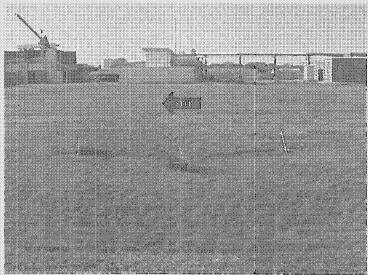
Proposed Site, NASA Consolidated Battery Test Facility, Johnson Space Center, Houston, Texas. Proposed site location of the NASA Consolidated Battery Test Facility viewed from T-4 Avenue along the Southern Boundary of the site, facing north.
